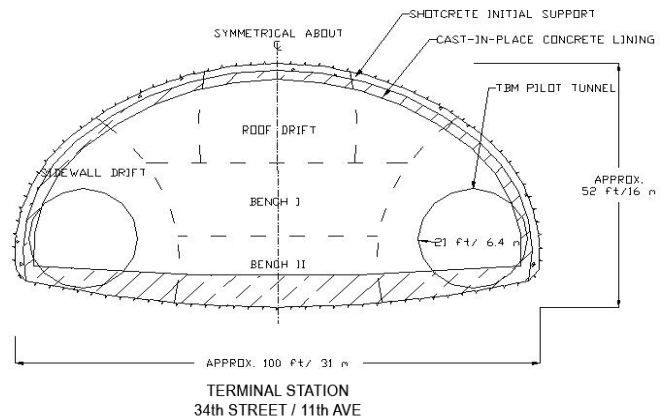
Construction concept for a terminal station with three tracks and two platforms.
